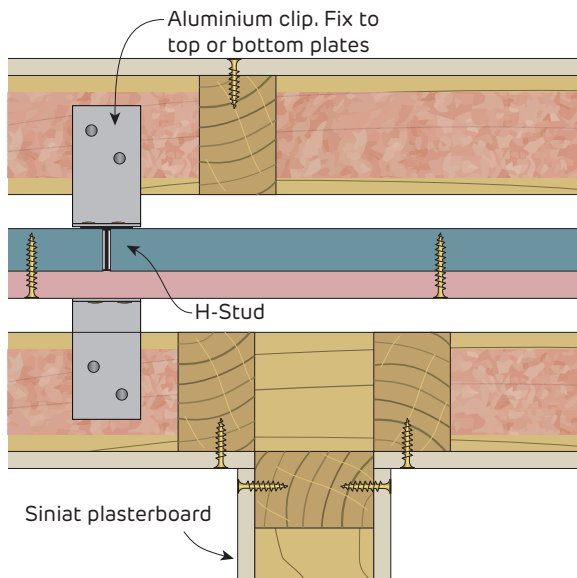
Interhome Wall with Non-Fire Rated Intersecting Wall
